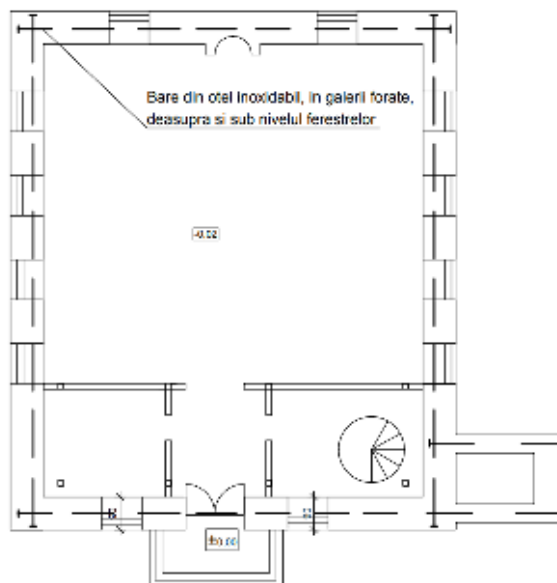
Plan with the arrangement of steel bars on a horizontal plane - Hunchiar mosque
